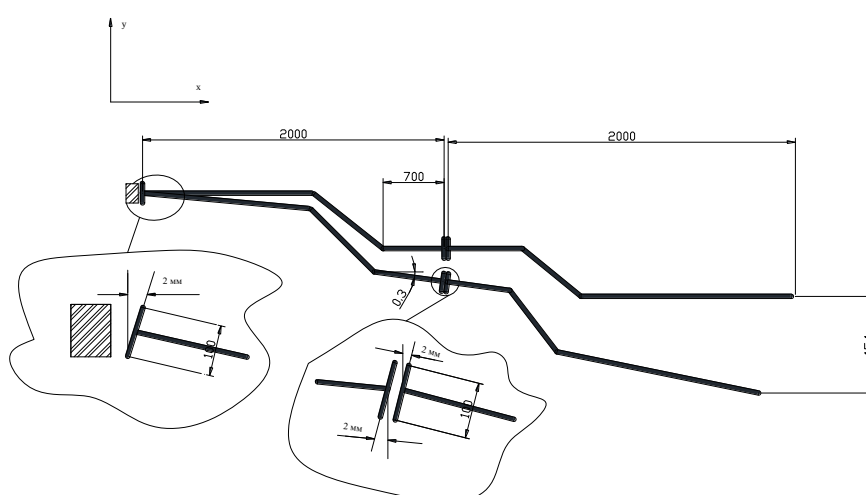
Route Deflection Chart after mounting two pipes manufactured with regulated tolerances.
